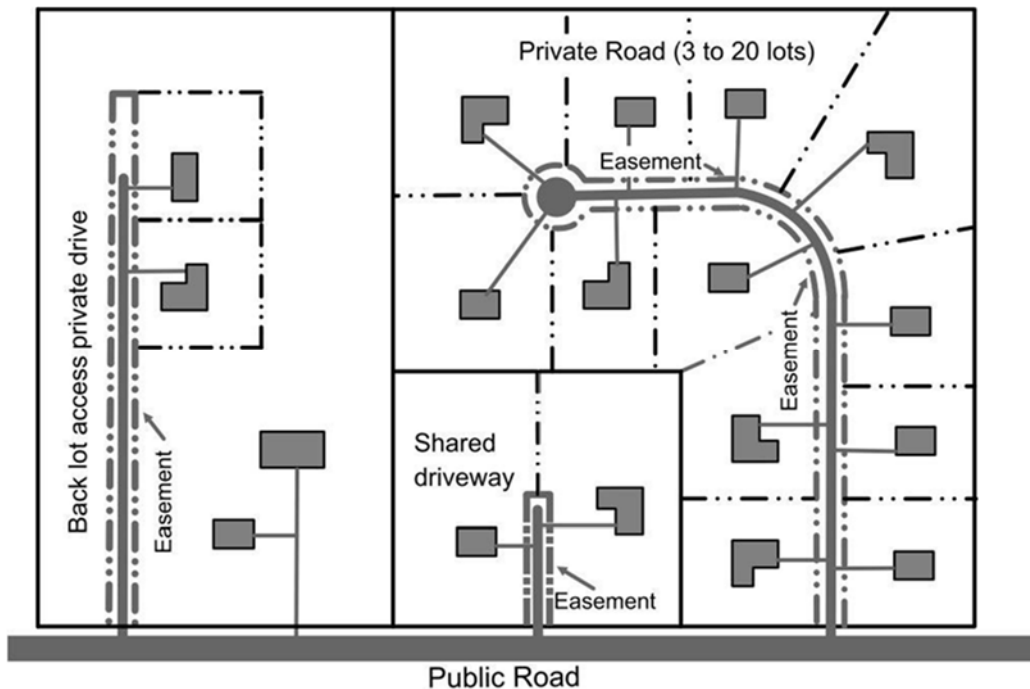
Examples of private means of access (Not to scale; see text for road widths and easement dimensions)
